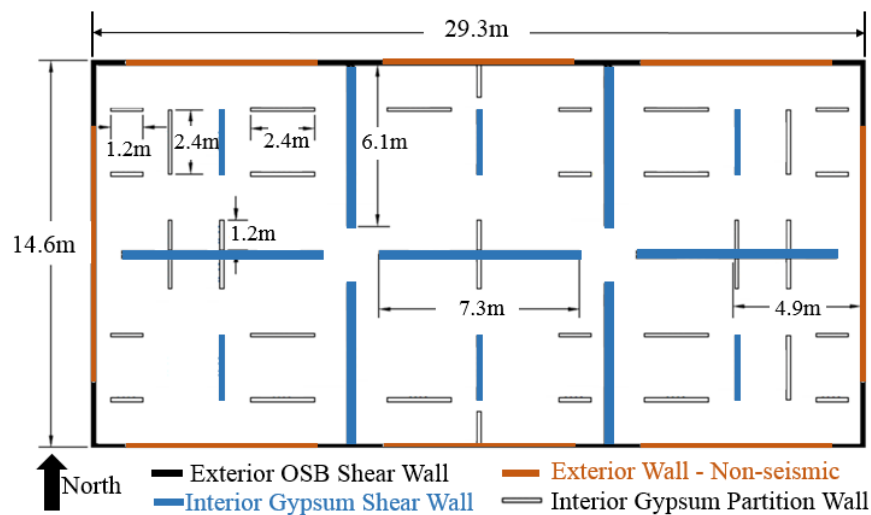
Plan view of the shear wall and bearing wall layout for the one-story multifamily wood frame archetype (modified from ATC 116 (2018)).
